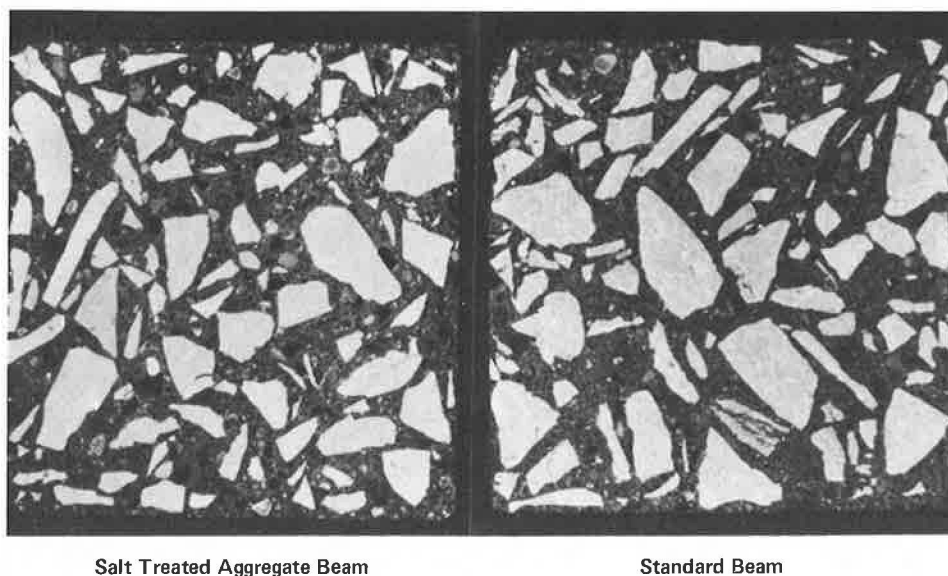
Sawed cross-sections of concrete beams made with Farmington Stone showing multiple fractures in salt-treated aggregates.
